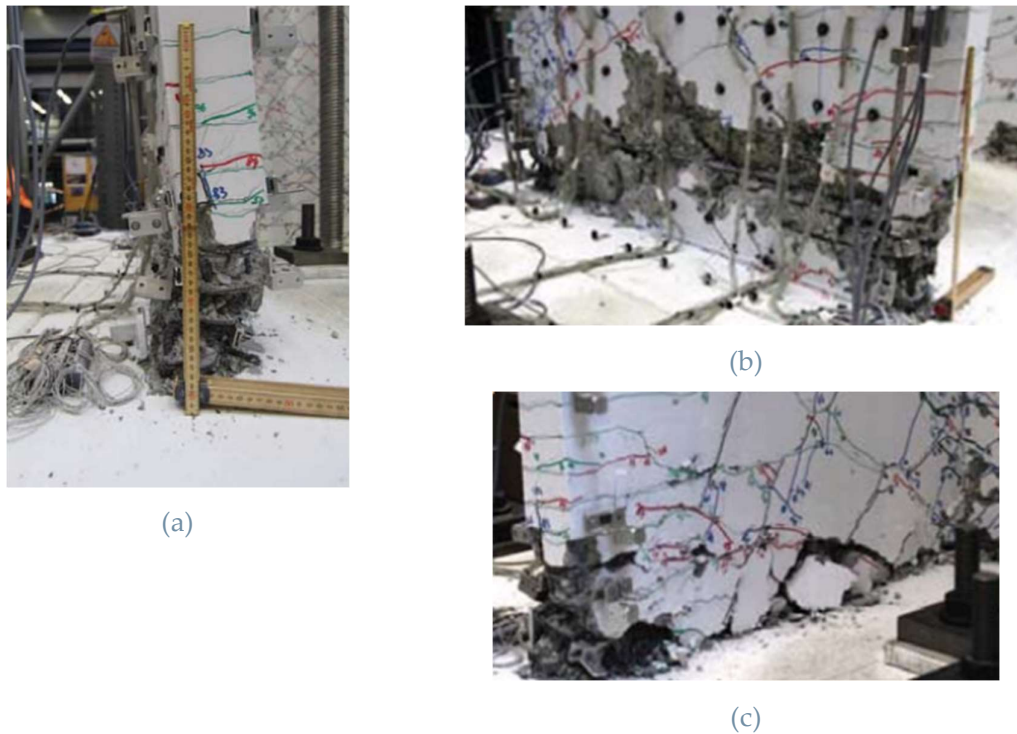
Failure of the West Flange TUC (Concentrated Reinforcement) (Constantin & Beyer, 2016)
